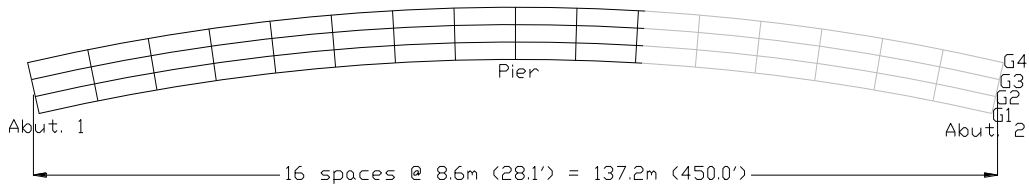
Stage 2 of Construction for Paired Girder (Inner Girders Placed First) Erection of Two Equal Span, 4-Girder, 305-m (1000-ft) Radius Bridge.
